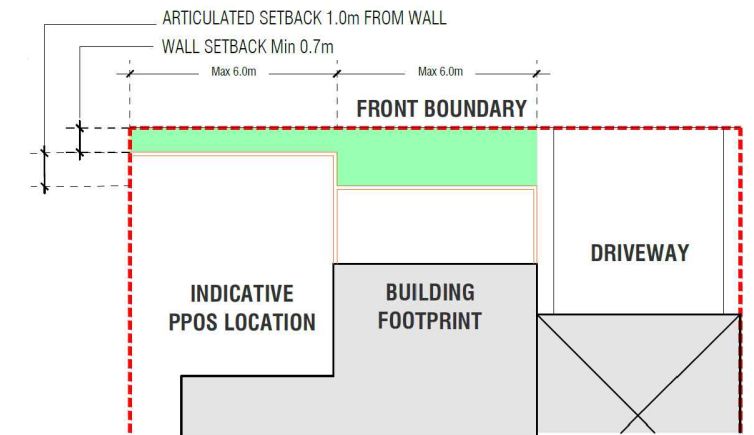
EXAMPLE - COURTYARD WALL, SHOWING ARTICULATED PLANTING ZONE SETBACK
